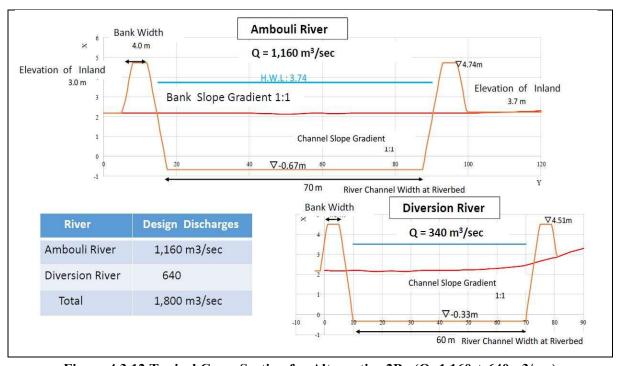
Typical Cross Section for Alternative 2B (Q=1,160 + 640m3/sec)
